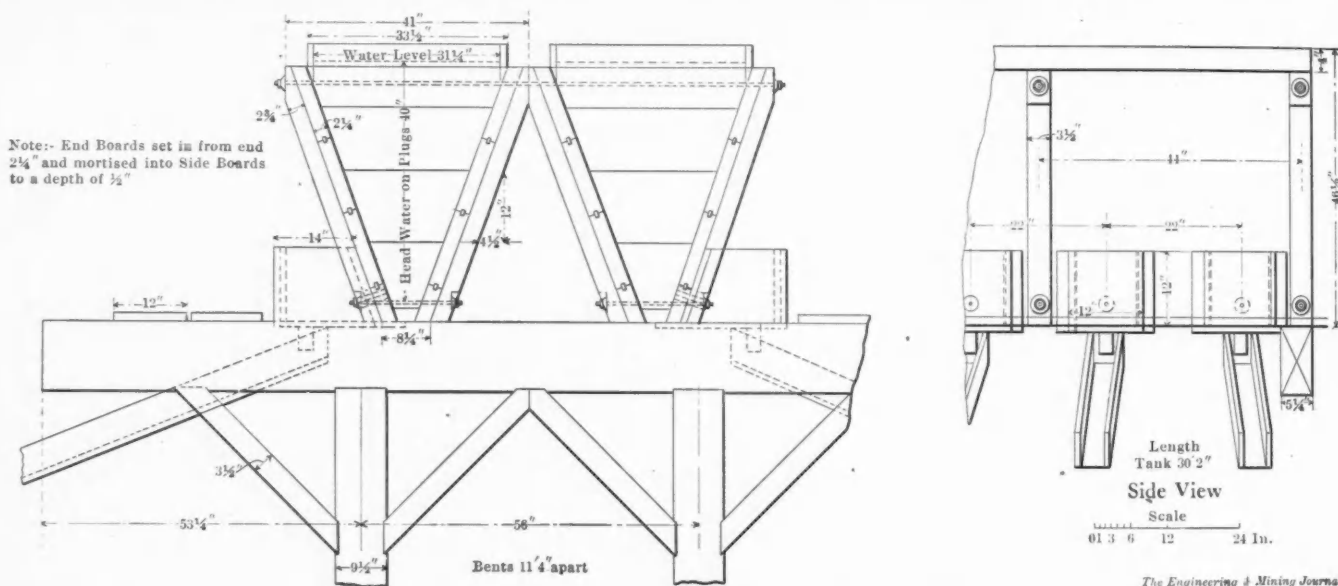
DOUBLE CLASSIFYING TANKS AT MAMMOTH MILL
